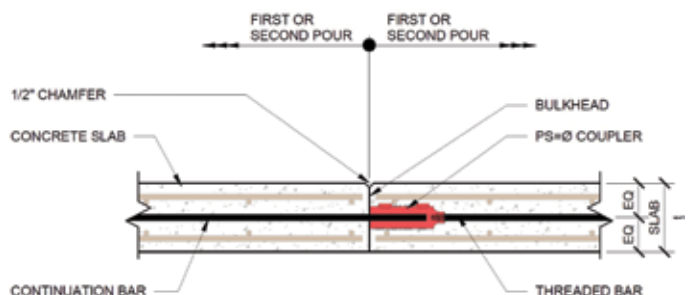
Typical PS=Ø slab-to-slab restraint relief joint
